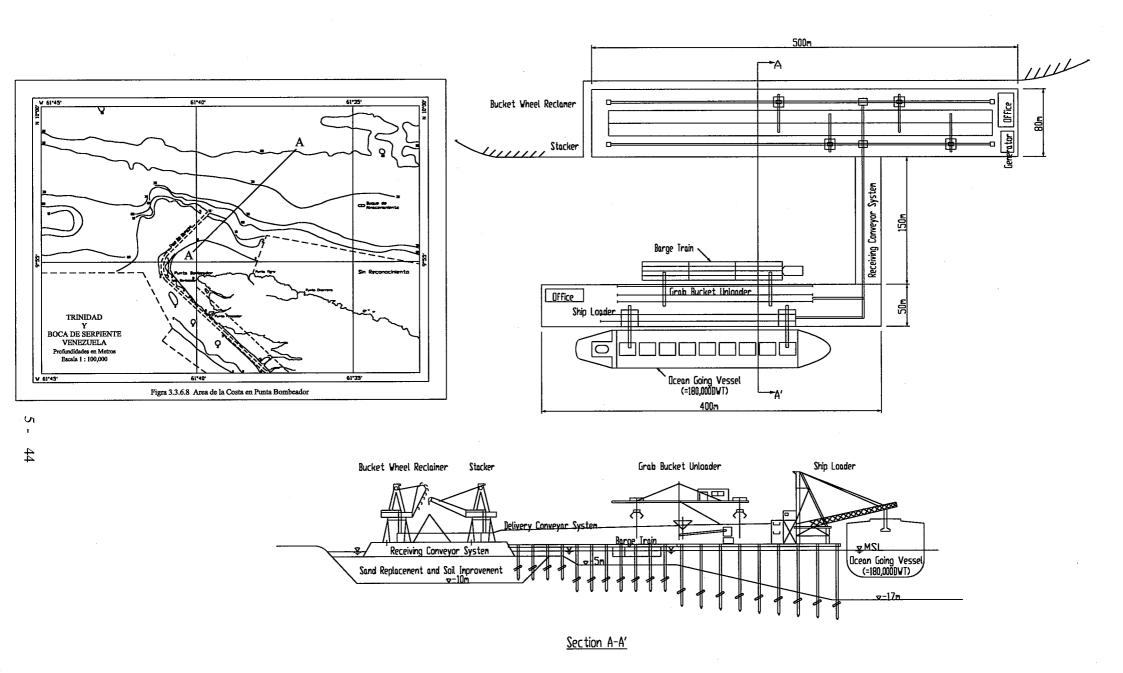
PROPOSED NEW PORT SYSTEM (ALTERNATIVE-D1)
